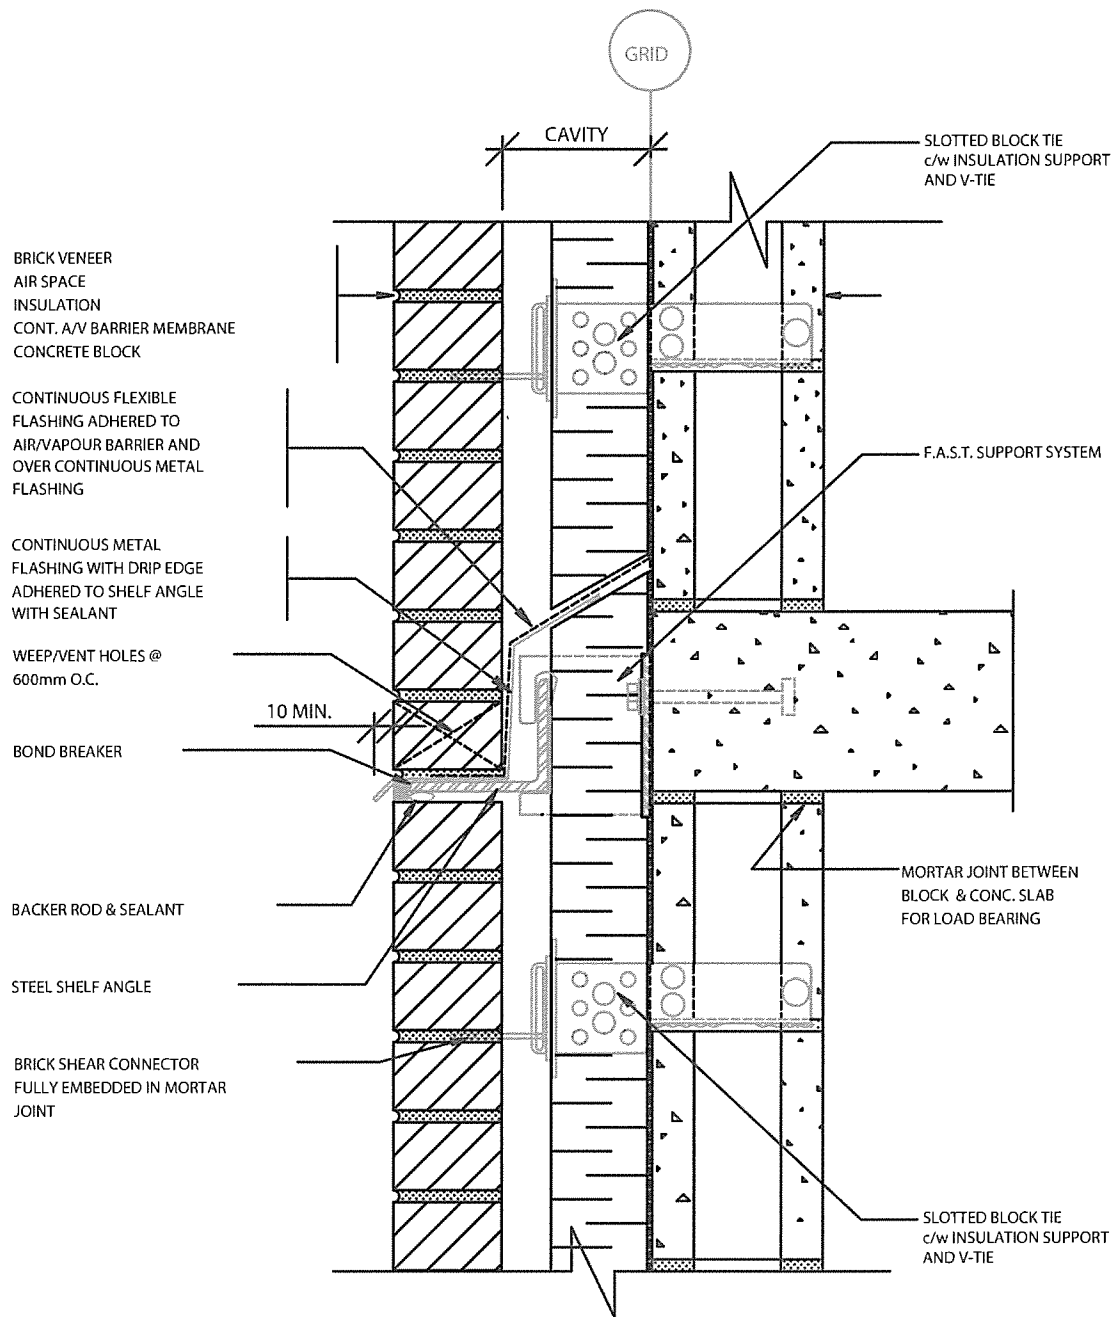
BRICK VENEER/CONCRETE BLOCK DETAIL AT SLAB EDGE
